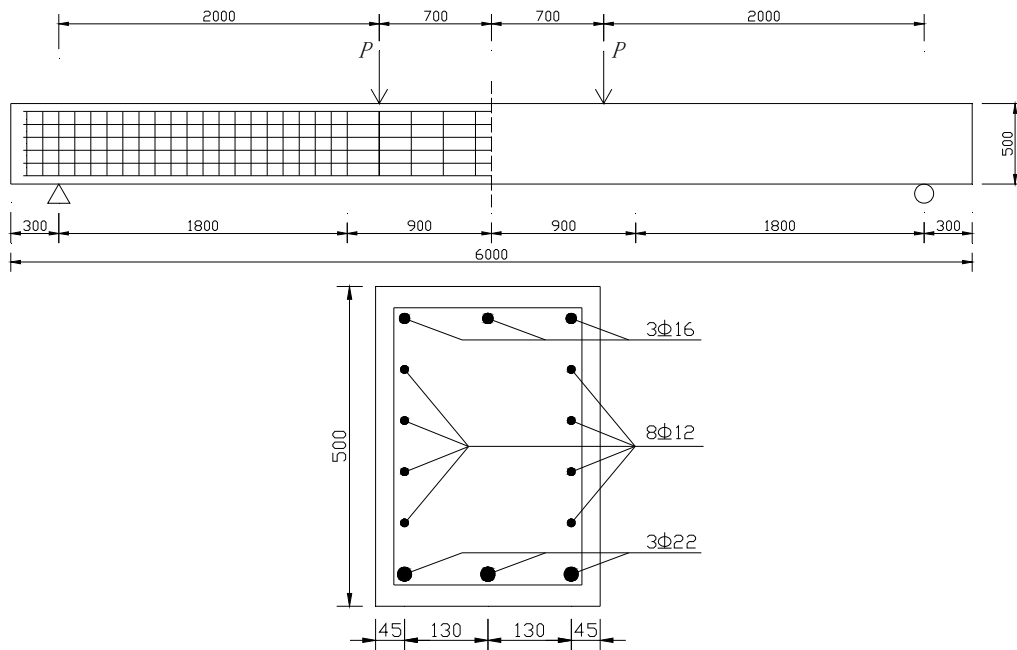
Dimension and Section Reinforcement Drawing of Test Beam(mm)
